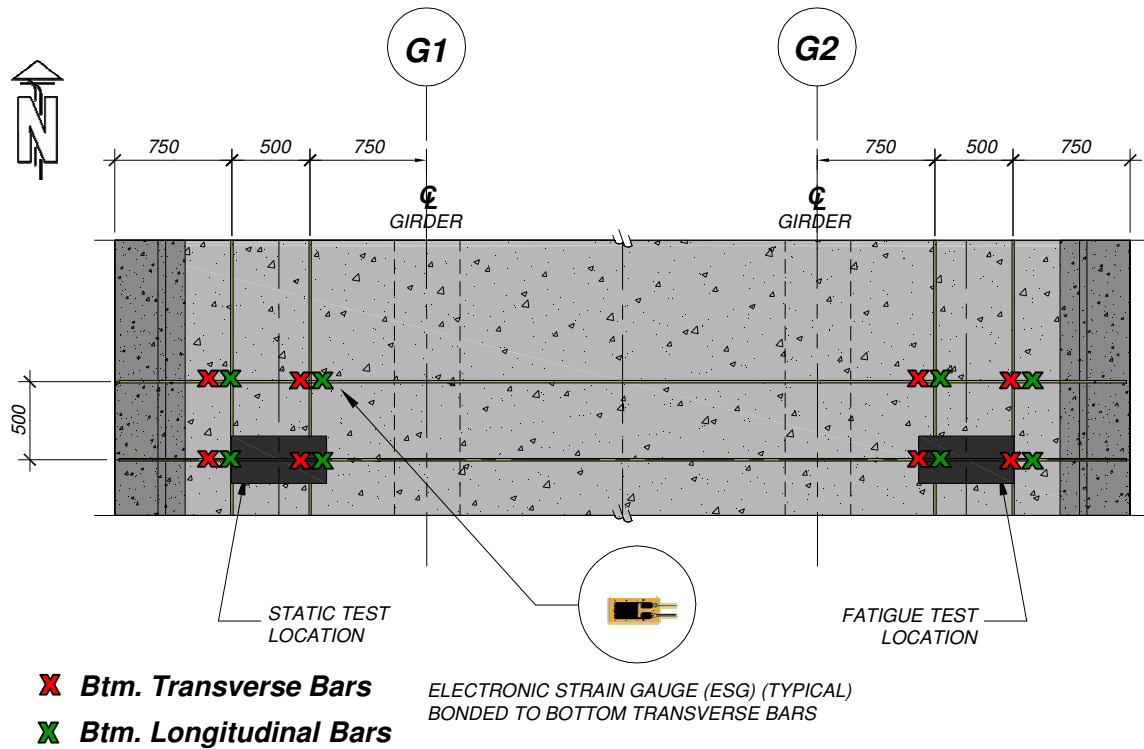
Schematic illustrating bottom transverse and longitudinal reinforcing bar strain gauge locations for the cantilever section with GFRP reinforcement
